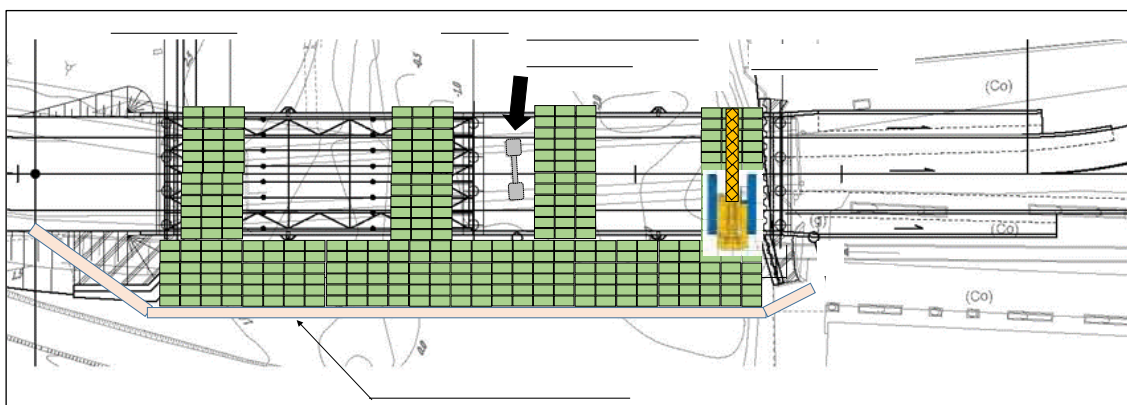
Old Mataniko Bridge Construction Plan
